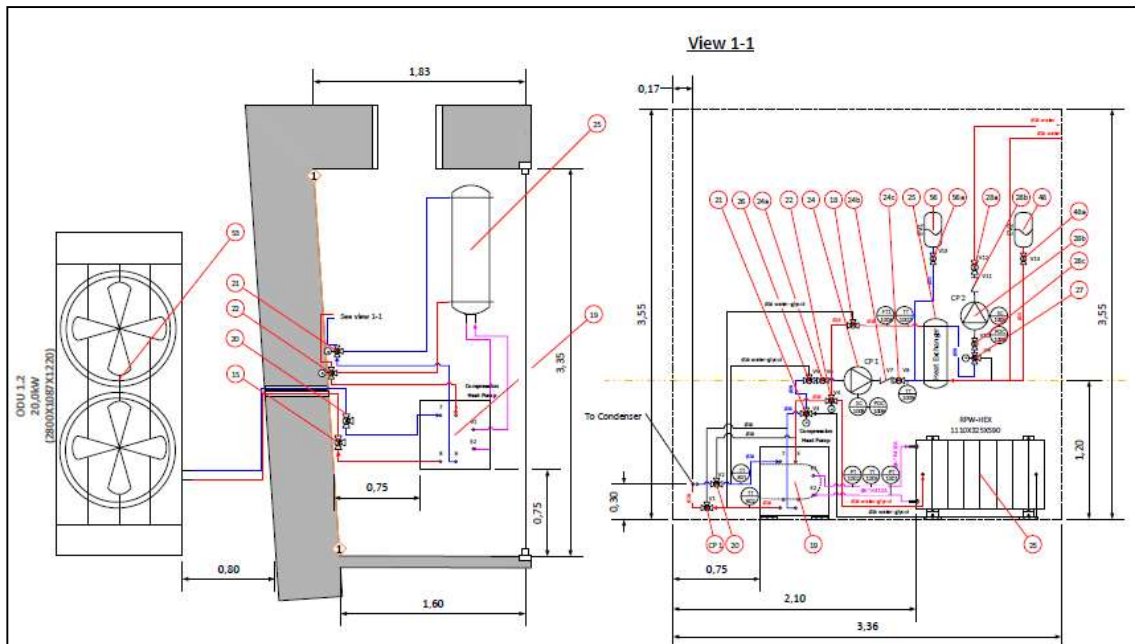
Plan of the mechanical room where indoor and outdoor components are placed
